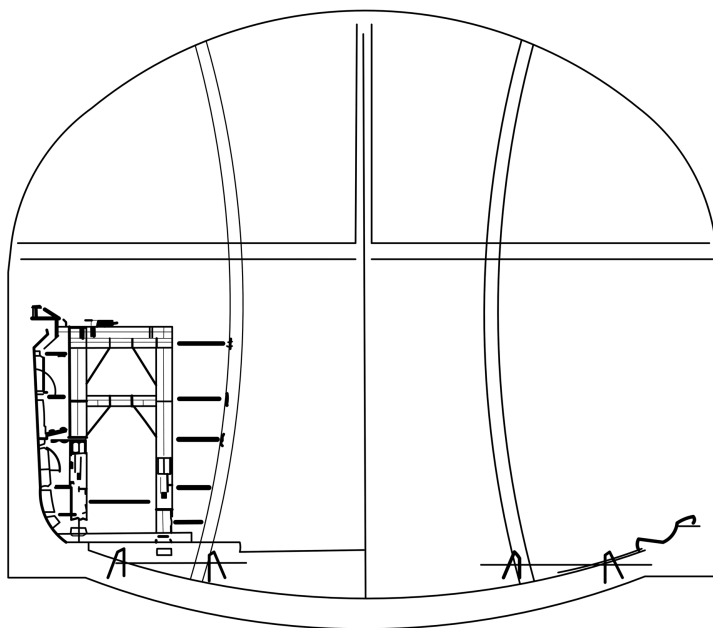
Low side wall inverted arch and side wall secondary lining trolley
